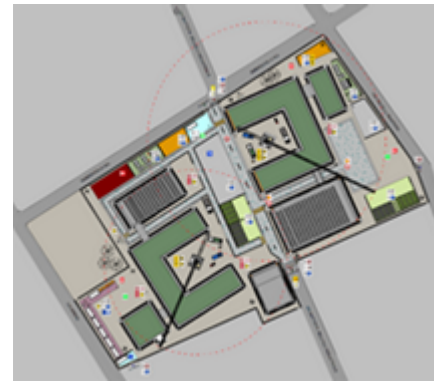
Construction site layout of the primary and secondary school of Inveruno.
